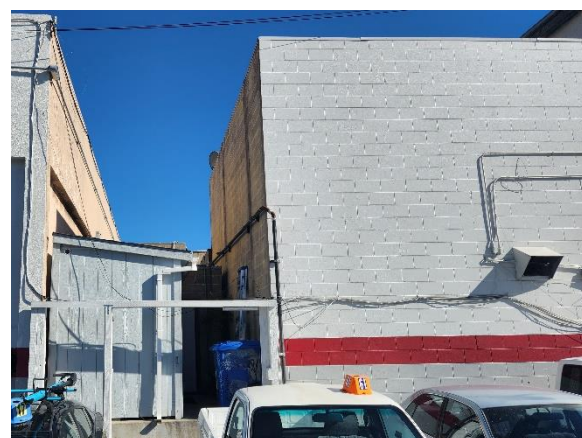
View of northwest corner of subject building, including alleyway behind adjacent building to the north. Looking east.
